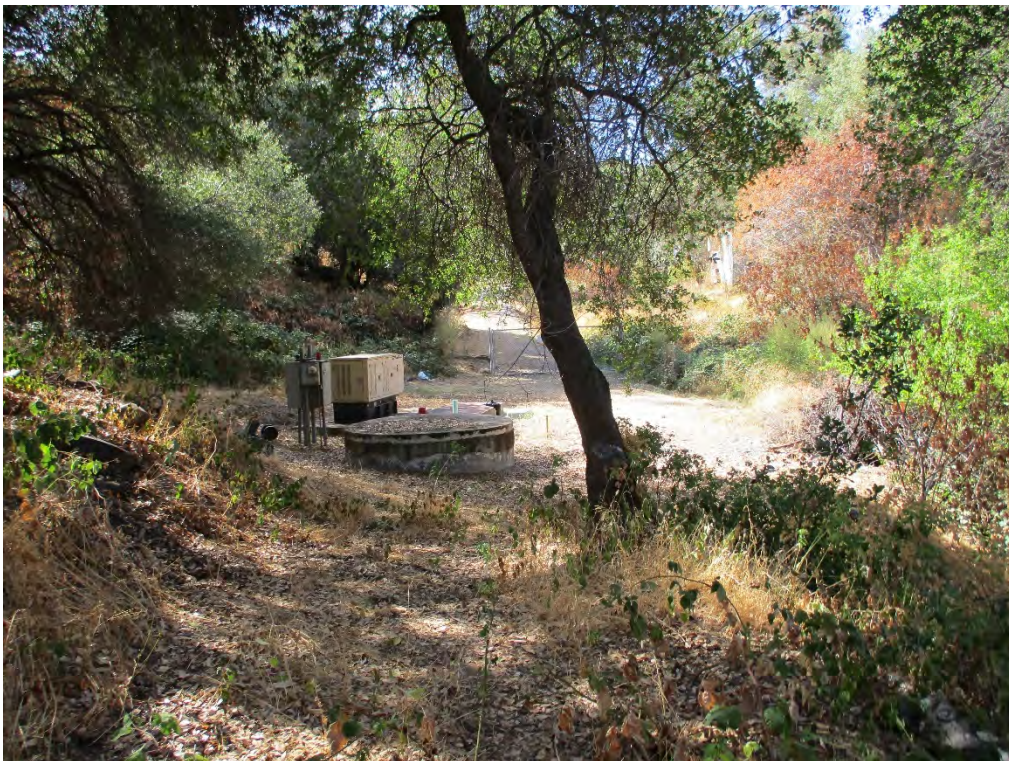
View looking north at the Developed/Disturbed area located at the center of the BSA, north of Center Street.
